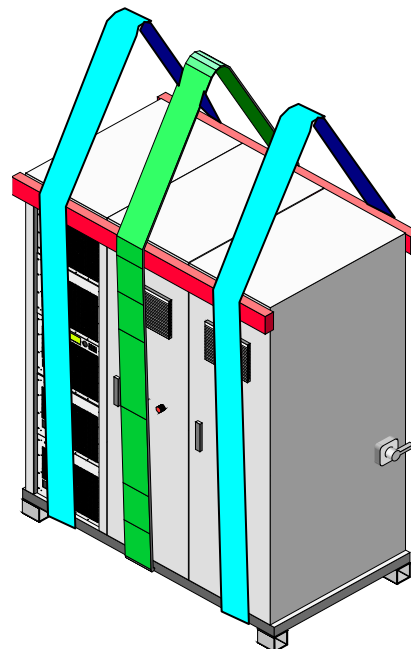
Usage of blocks of wood as protection against mechanical damage (lifting using 2 (better 3) carrying straps)
